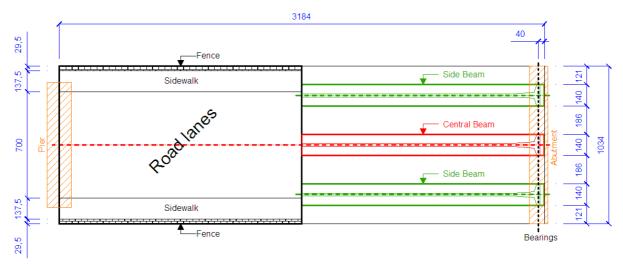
Planar geometry of the deck between a pier and an abutment (annotations in cm)
